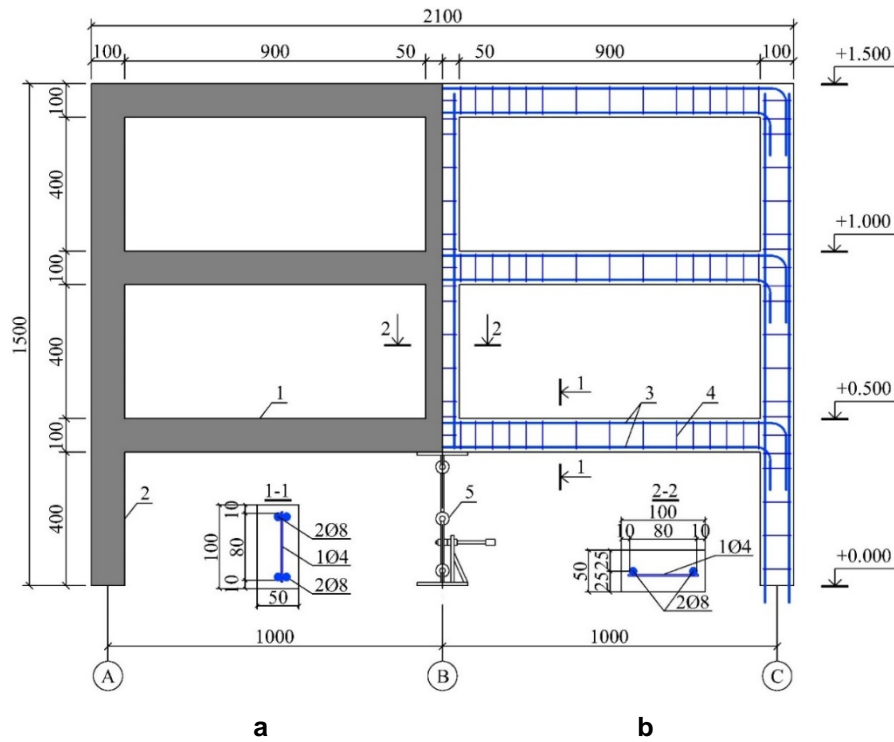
The formwork scheme (a) and the reinforcement scheme (b) of the frame structure: 1 – beam; 2 – column; 3 – longitudinal reinforcement; 4 – transverse reinforcement; 5 – equipment modeling loss of column.
